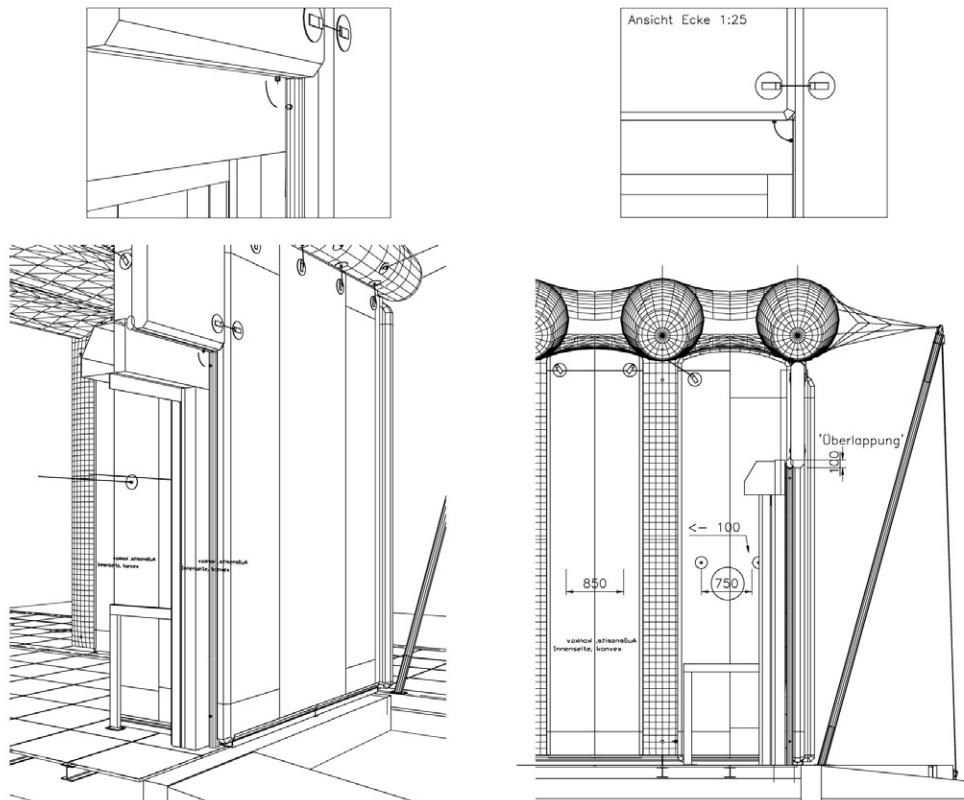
Air-tensioned membrane slabs are fixed to each other in the end elevation (left), and to separating transparent membrane envelopes in the side elevation (right).
